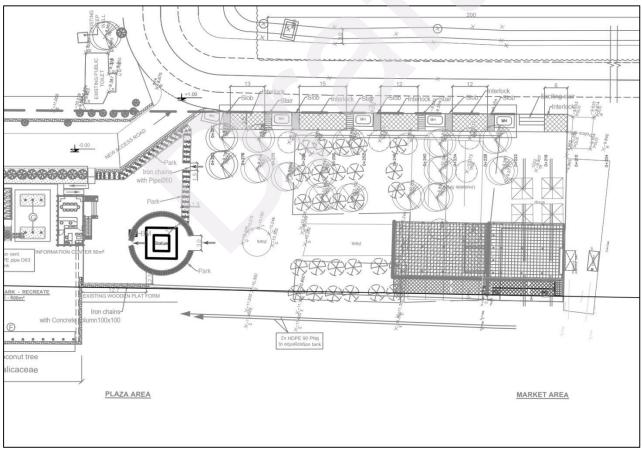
Top view of the additional improvement at the walkway and crab boiling section
